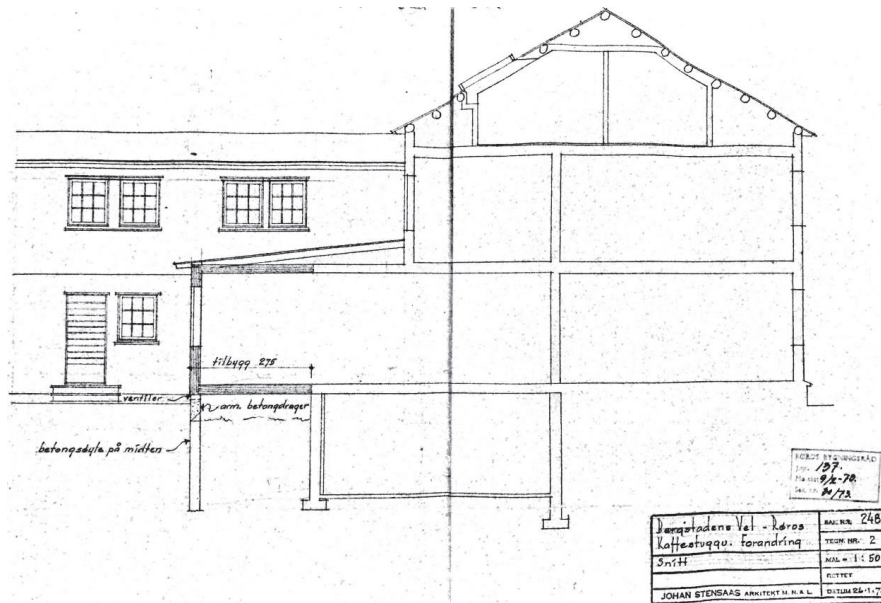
A cross section of the main building Kaffestuggu with the proposed enlargement of the former extension. (Drawing by architect Johan Stensaas, 1973, Røros kommune).
